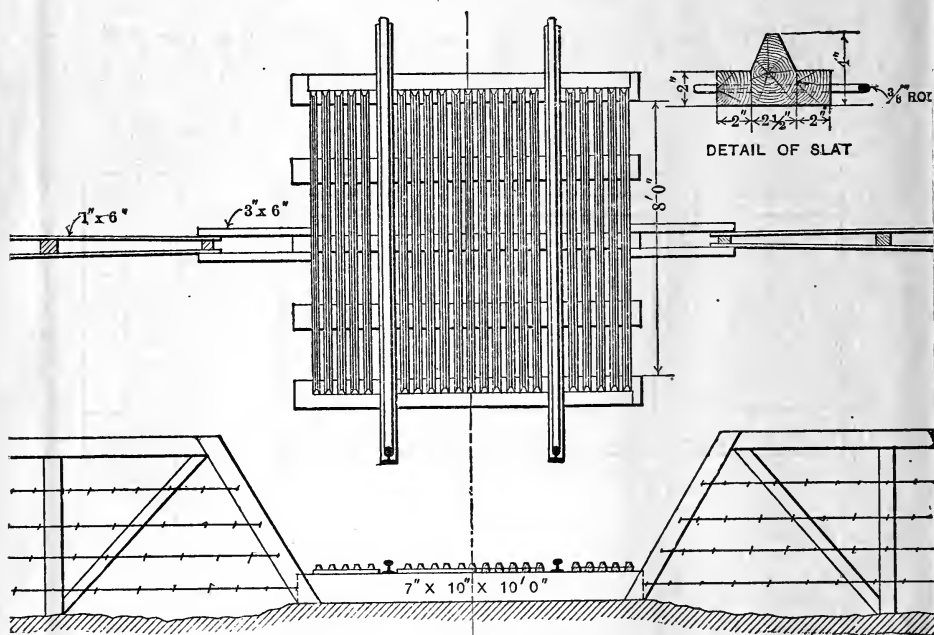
CATTLE-GUARD WITH WOODEN SLATS.
